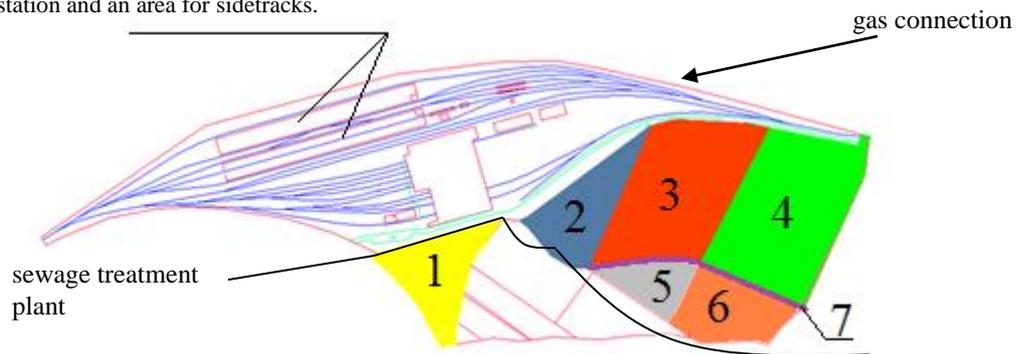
The site of the existing Rolling Stock Repair and Operation Section in Sochaczew along with the plots of land acquired for the development.
